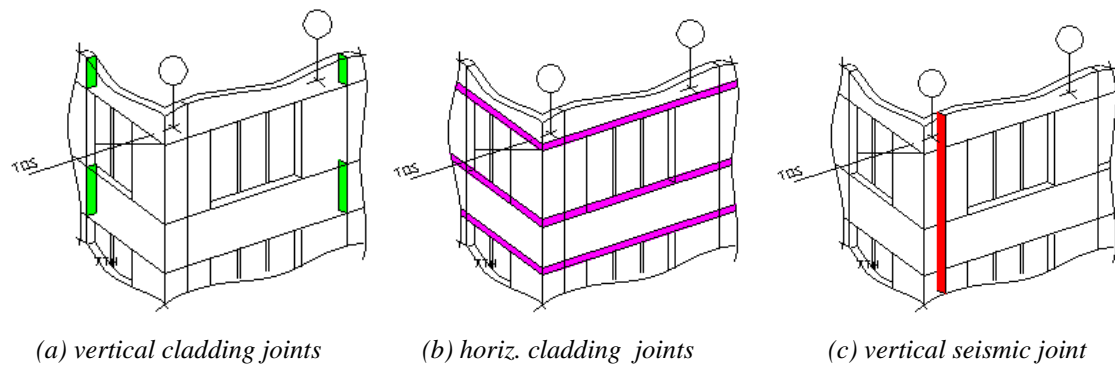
Cladding panel joints (McMullin and Nguyen, 2008)
